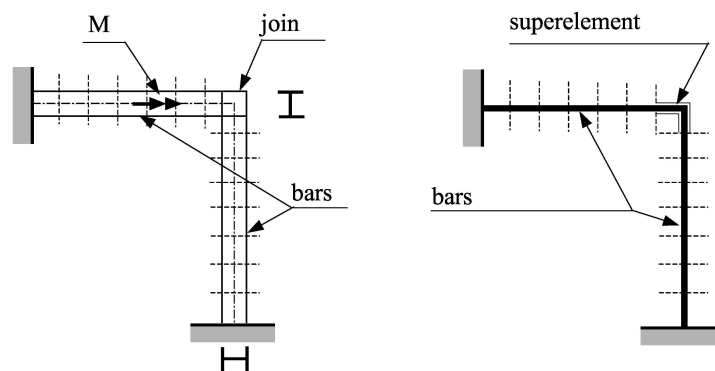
Frame assembled with the thin-walled members of the bisymmetric open cross-section
